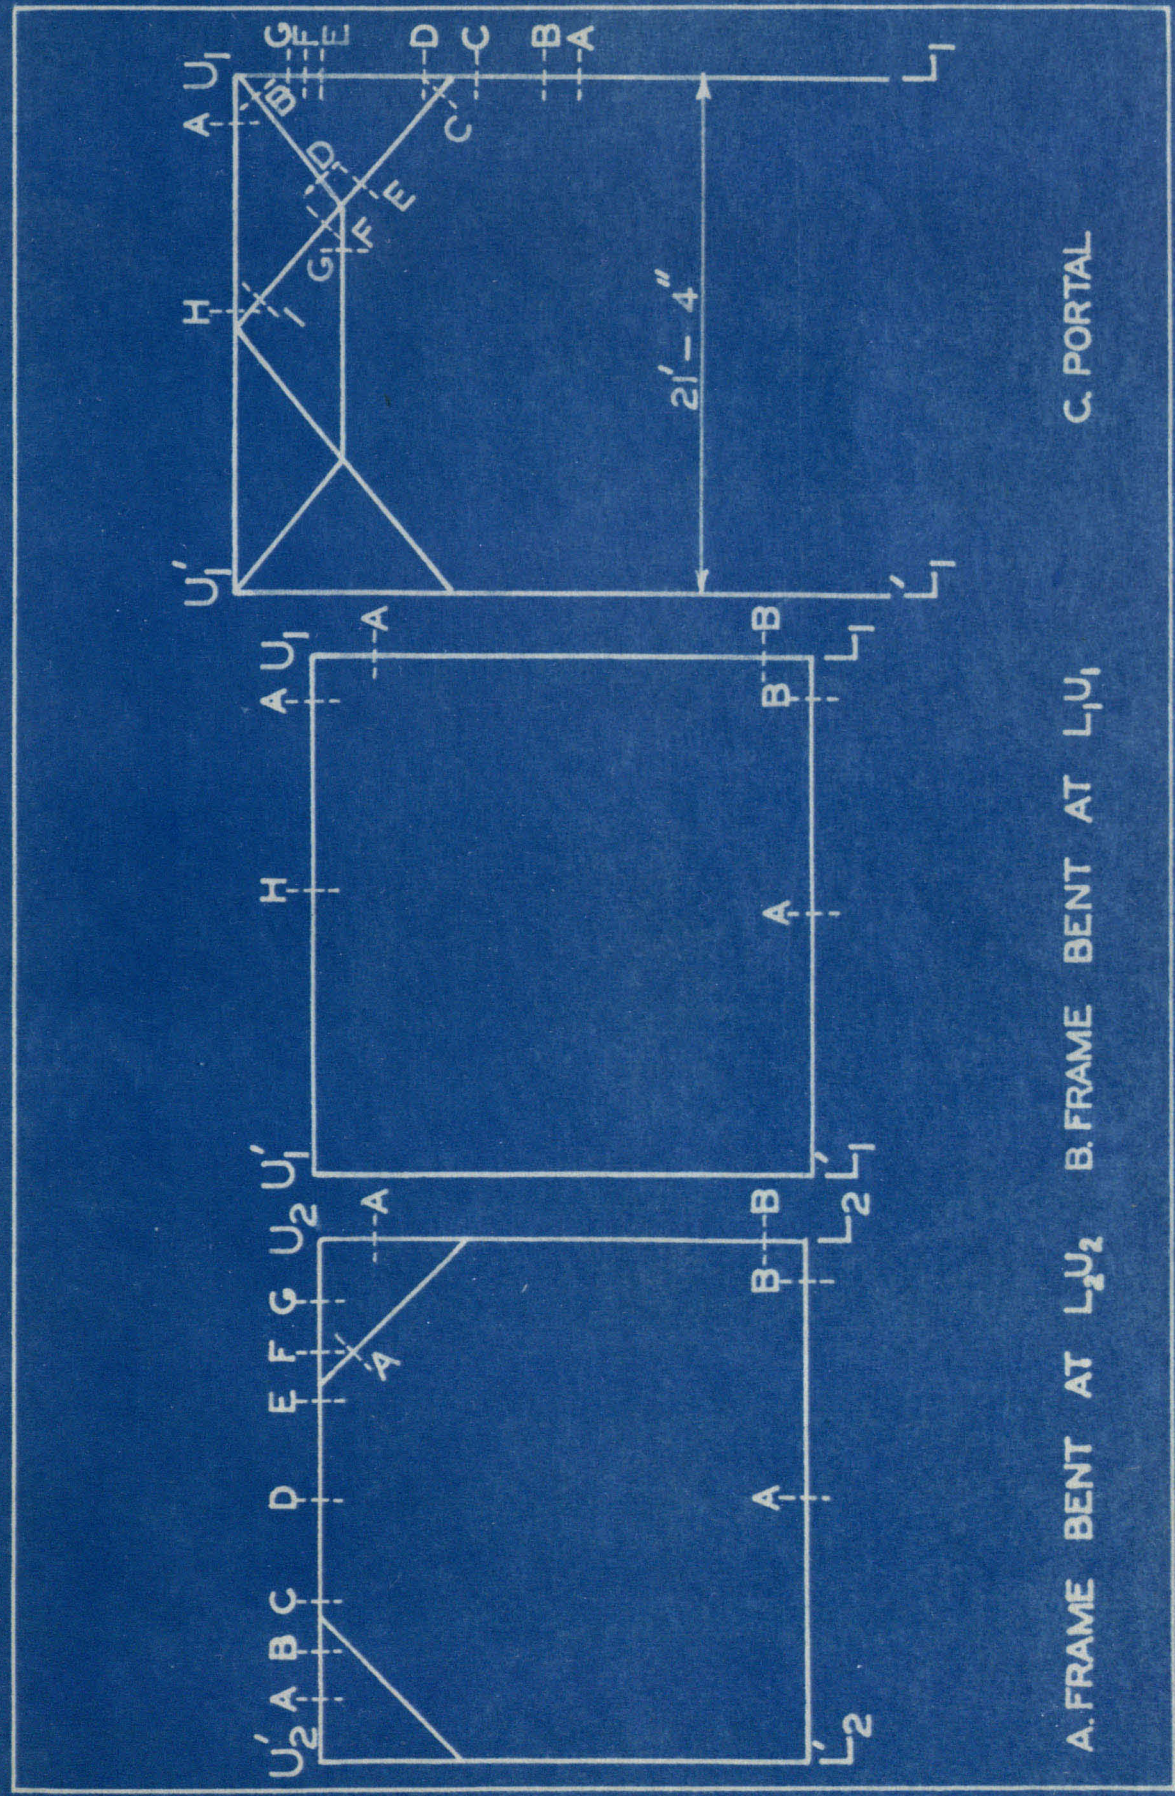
ELEVATION OF TRANSVERSE BENTS SHOWING LOCATION OF GAGE LINES
